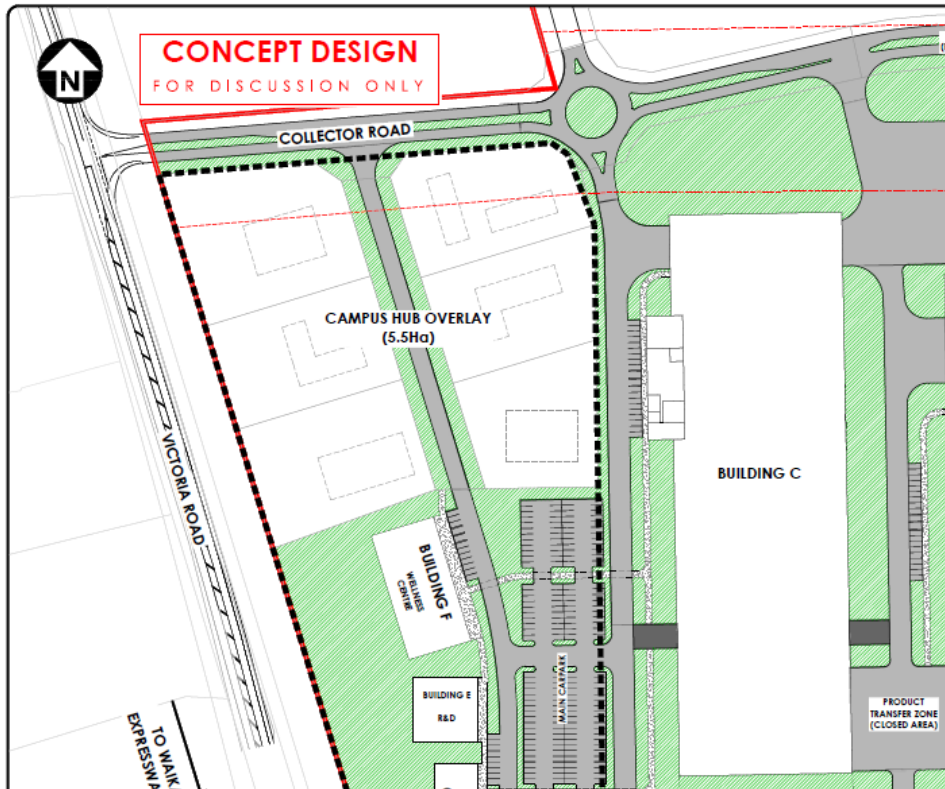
showing new southern intersection, (BIL Ltd APL Master Plan Layout 10 Oct 2018.)
